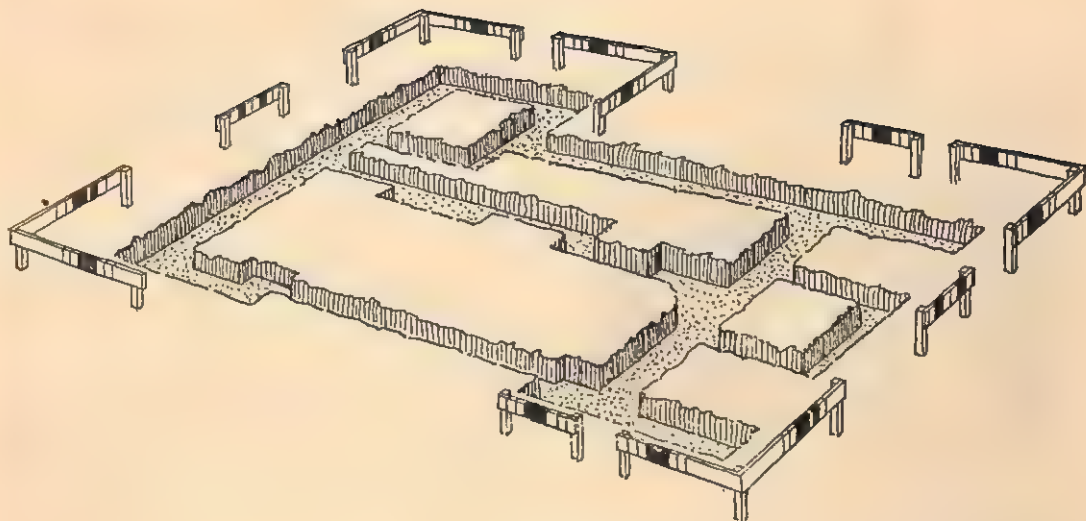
Ready for the bricklayers. Profiles have been erected, trenches dug and foundation concrete poured into them.
